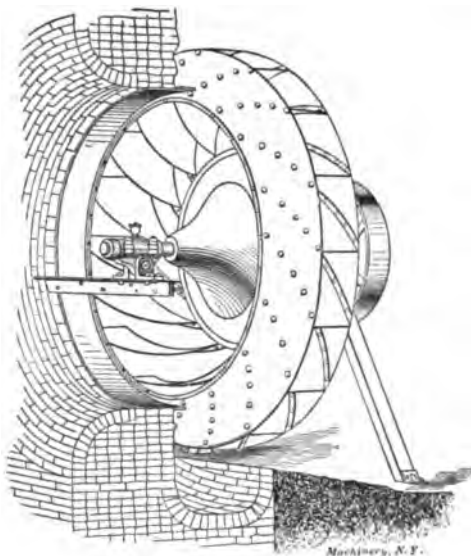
Cone Fan Placed in Opening in Brick Wall
